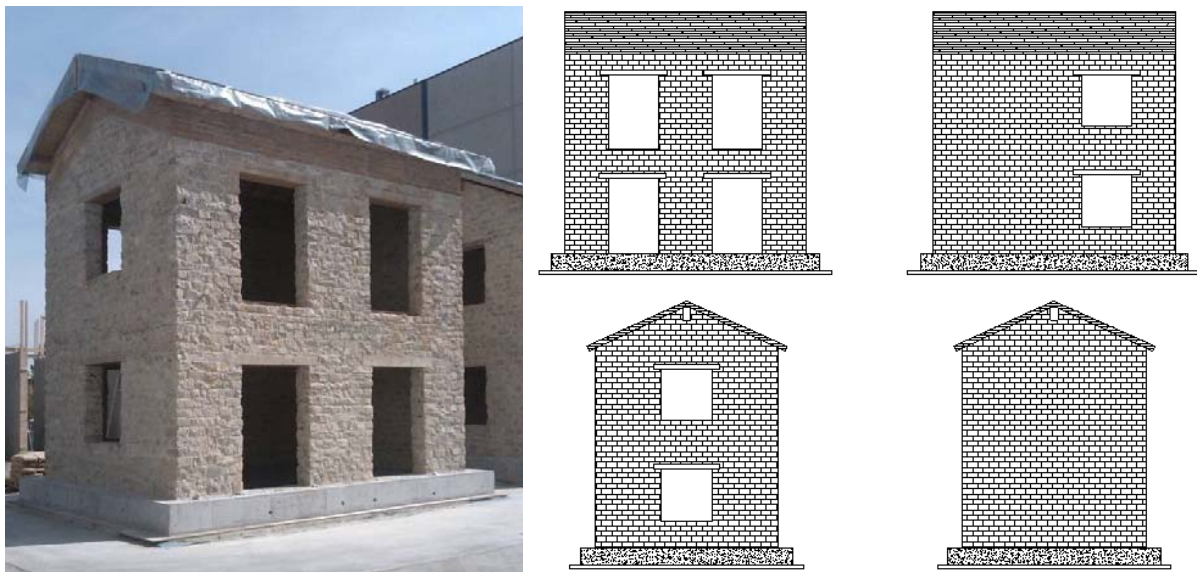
3D View of the un-reinforced stone building (left); N-S-W-E fronts (right)
